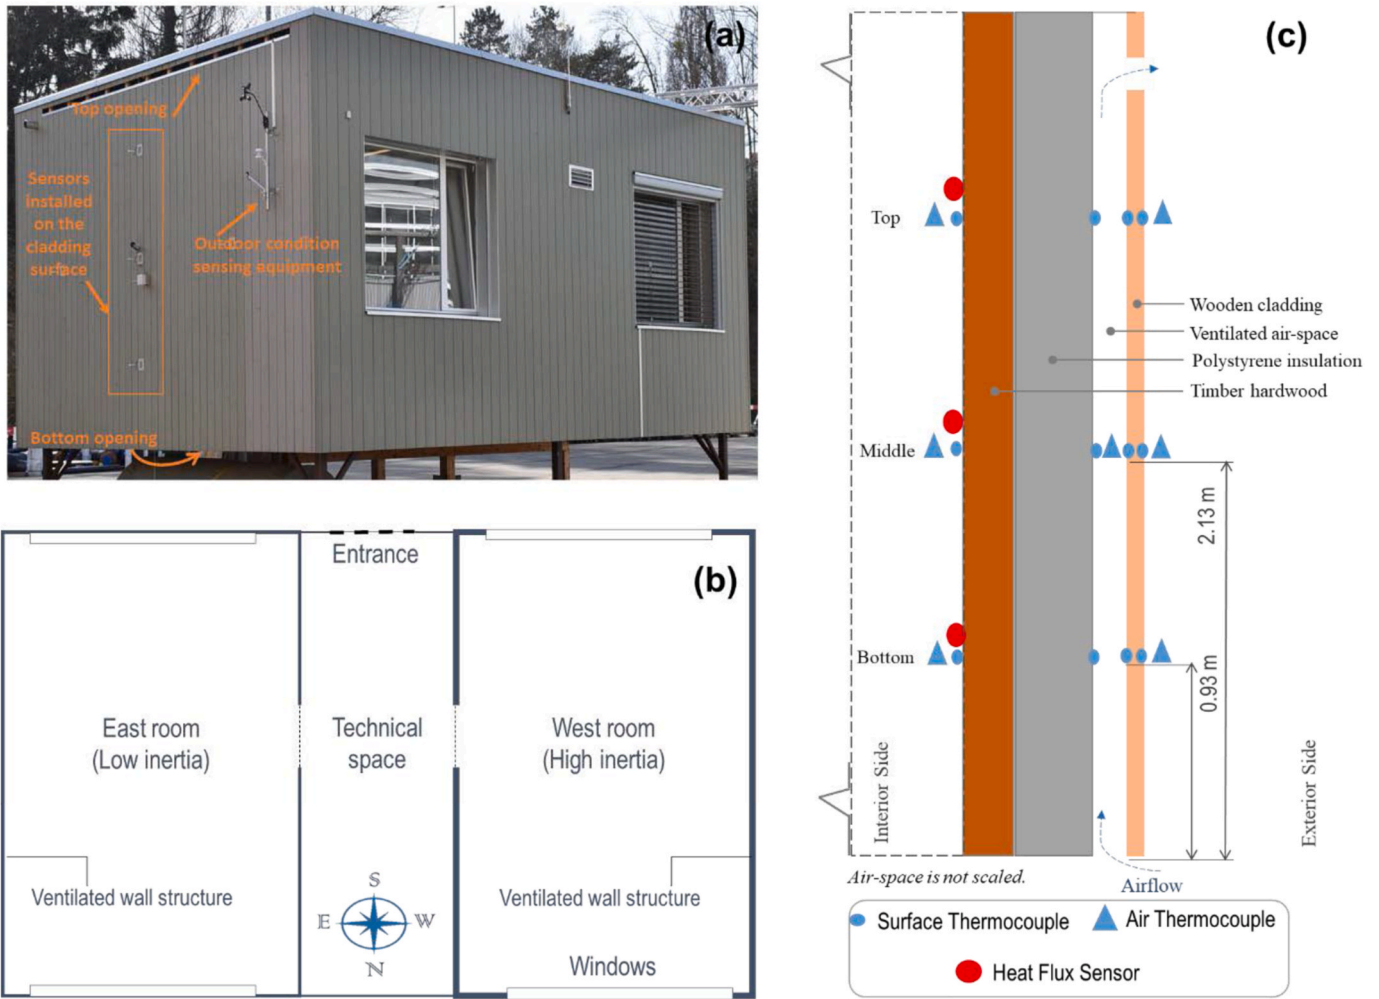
(a) Outside view of the test facility, (b) floor plan of the test facility, (c) Cross-section schematic of the sensors installed on different surfaces of the East-oriented wall (a similar configuration is set up for the West wall).
